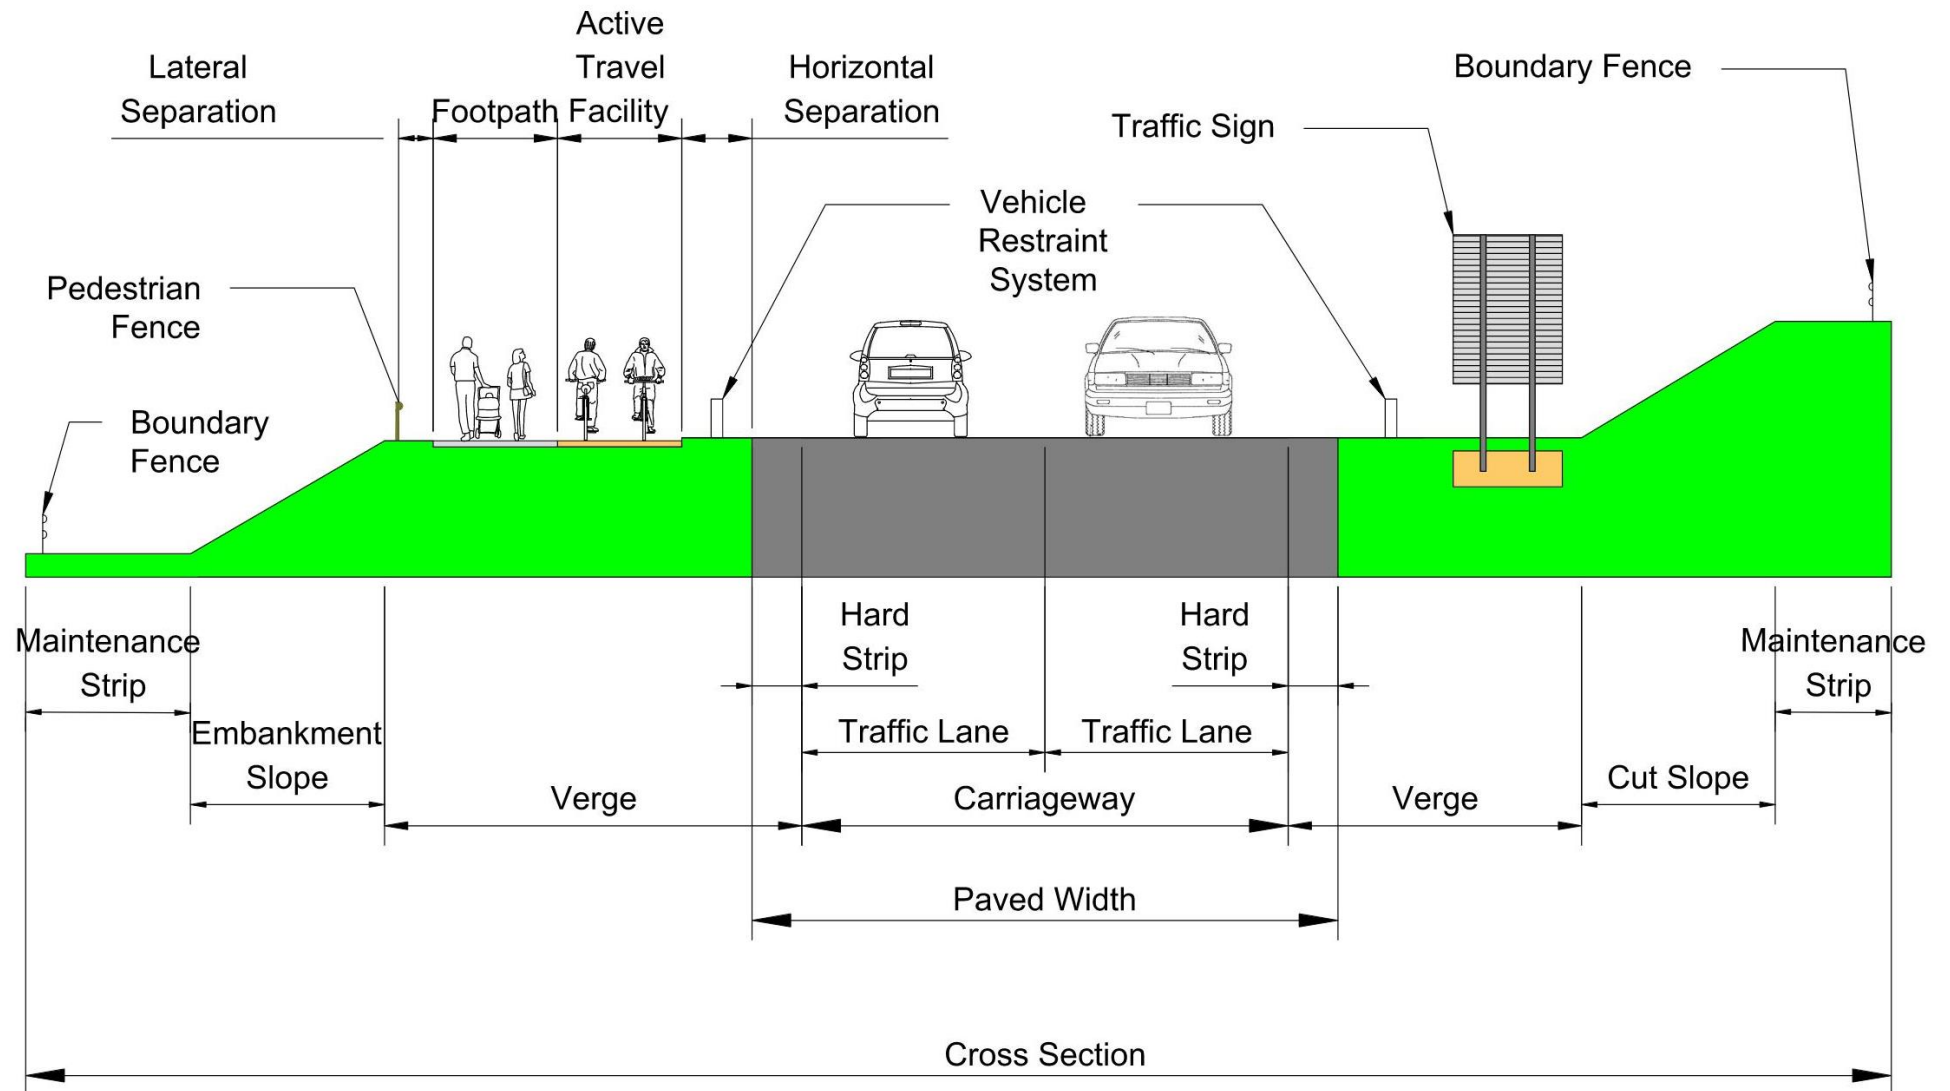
Typical Rural Type 2 / Type 3 Single Carriageway Cross Section Components
